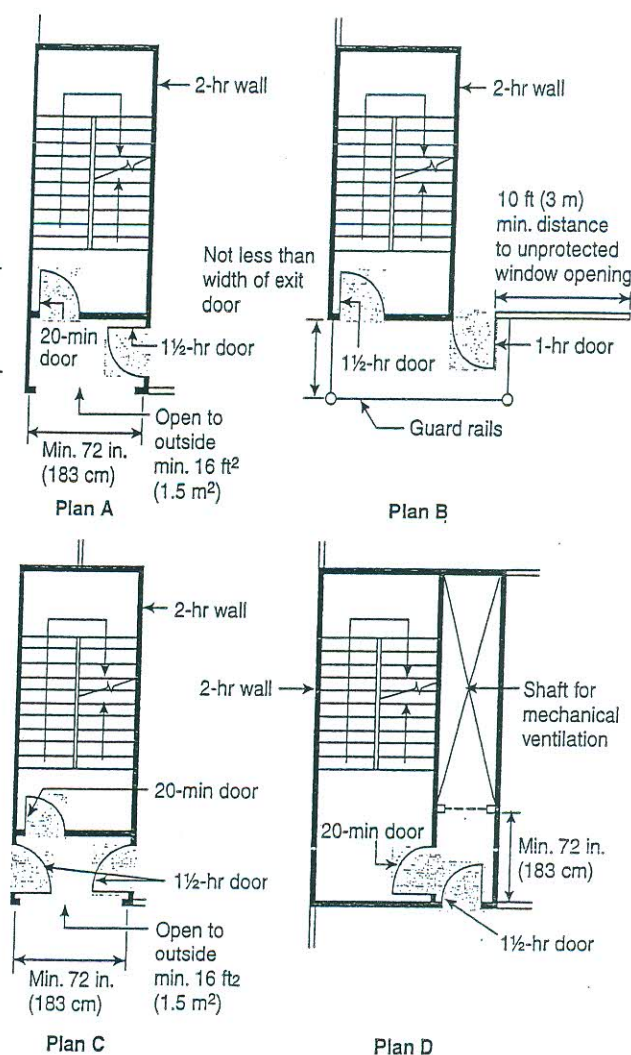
Four Variations of Smokeproof Towers. Plan A has a vestibule opening from a corridor. Plan B shows an entrance by way of an outside balcony. Plan C could provide a stair tower entrance common to two areas. In Plan D, smoke and gases entering the vestibule would be exhausted by a natural or induced draft in the open air shaft. In each case, a double entrance to the stair tower with at least one side open or vented is characteristic of this type of construction. Pressurization of the stair tower in the event of fire provides an attractive alternate for tall buildings and is a means of eliminating the entrance vestibule.
